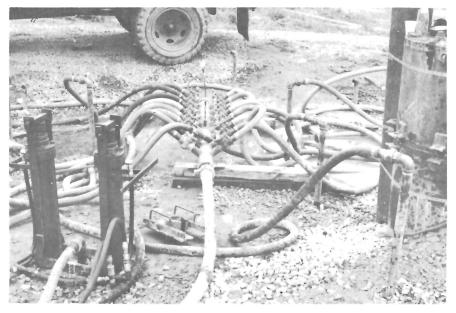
Multiple outlet grout manifold and hydraulic pullers. GSC 118688.
